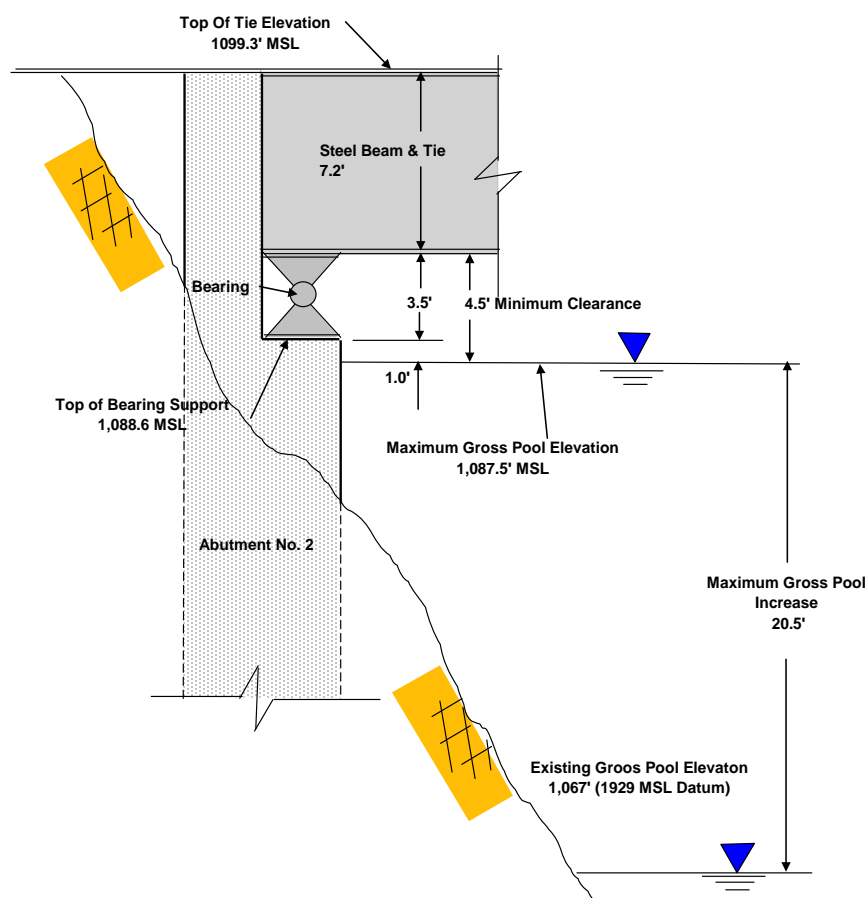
Elevation Sketch Showing the South End of the Pit River Bridge with Respect to the Existing and Increased Full Pool Elevation at Shasta Lake
